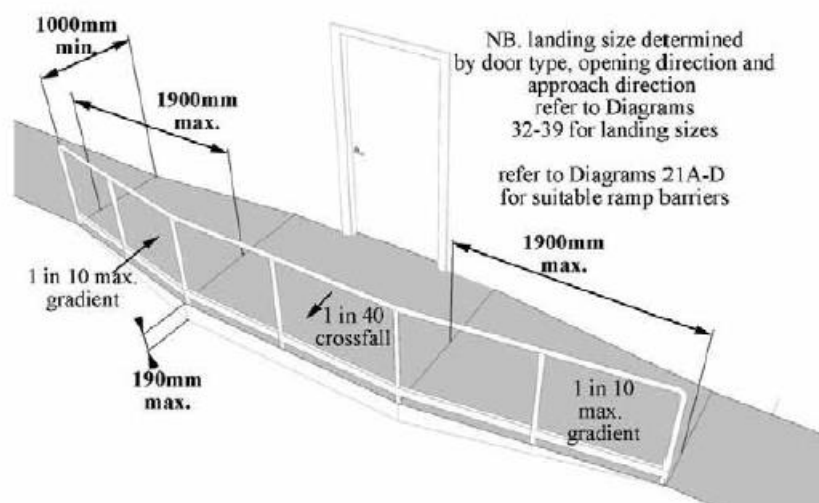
Step Ramp at External Doorway – Side Approach
